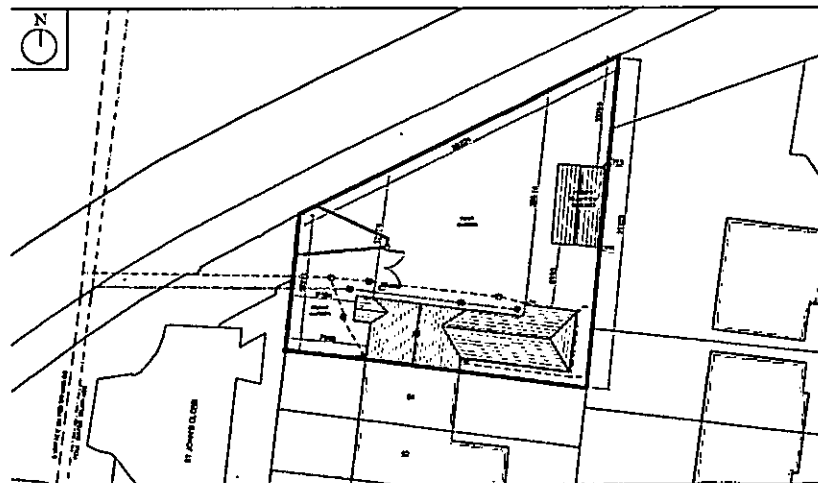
Existing site layout (FFL of existing house is 65.50.)
